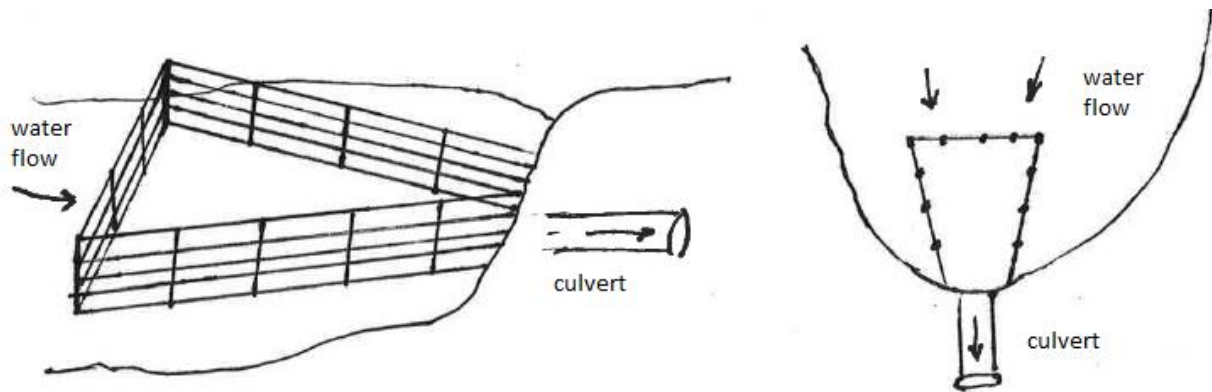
Trapezoidal culvert fencing installed on the upstream side of the culvert (Image: Vanderhoof 2017)
